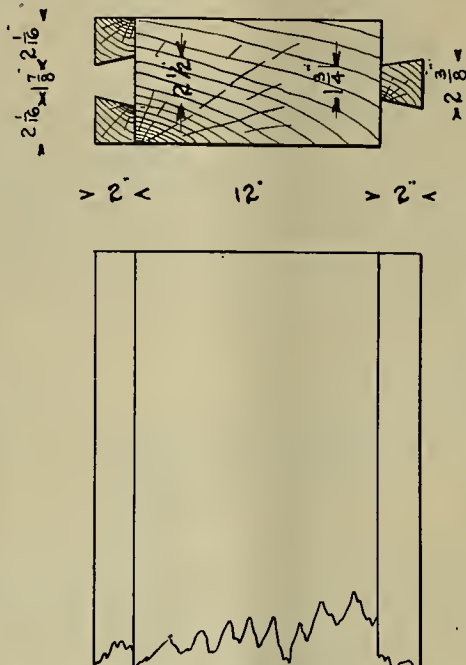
Sheet Piling, Railroad Subway, Oakland, Cal.
